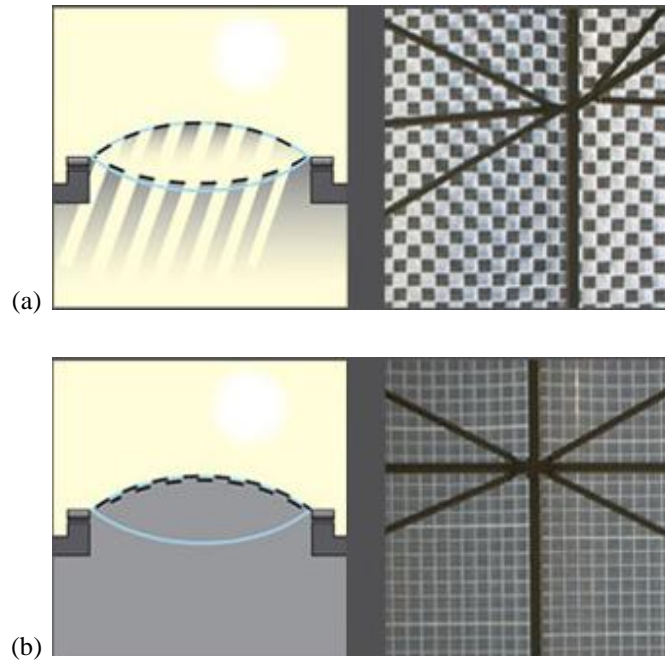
Open (a) and closed (b) inner layer of printed ETFE cushion (Vector Foiltec, 2011g)
